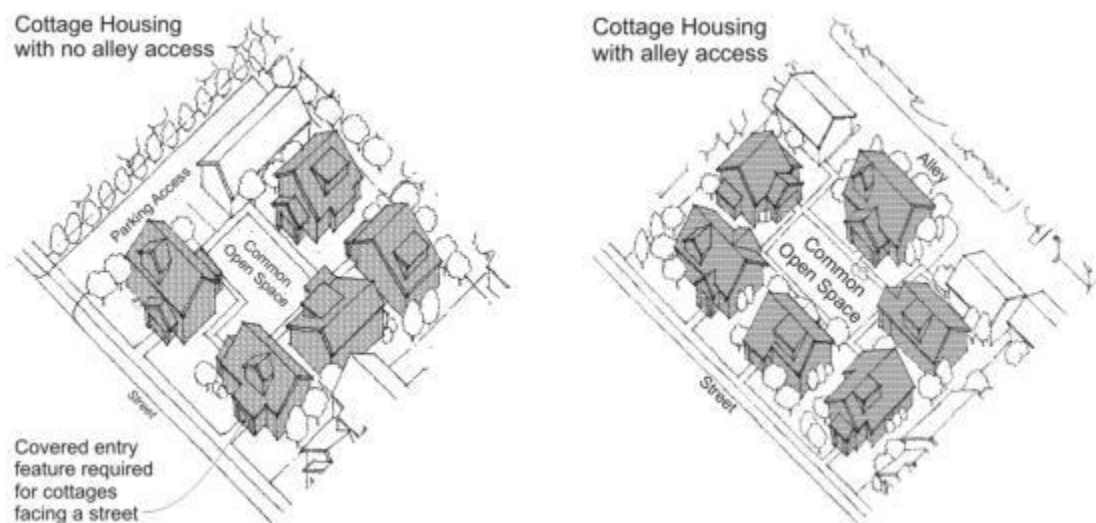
(M)(1). Typical [cottage](#) housing layouts.
